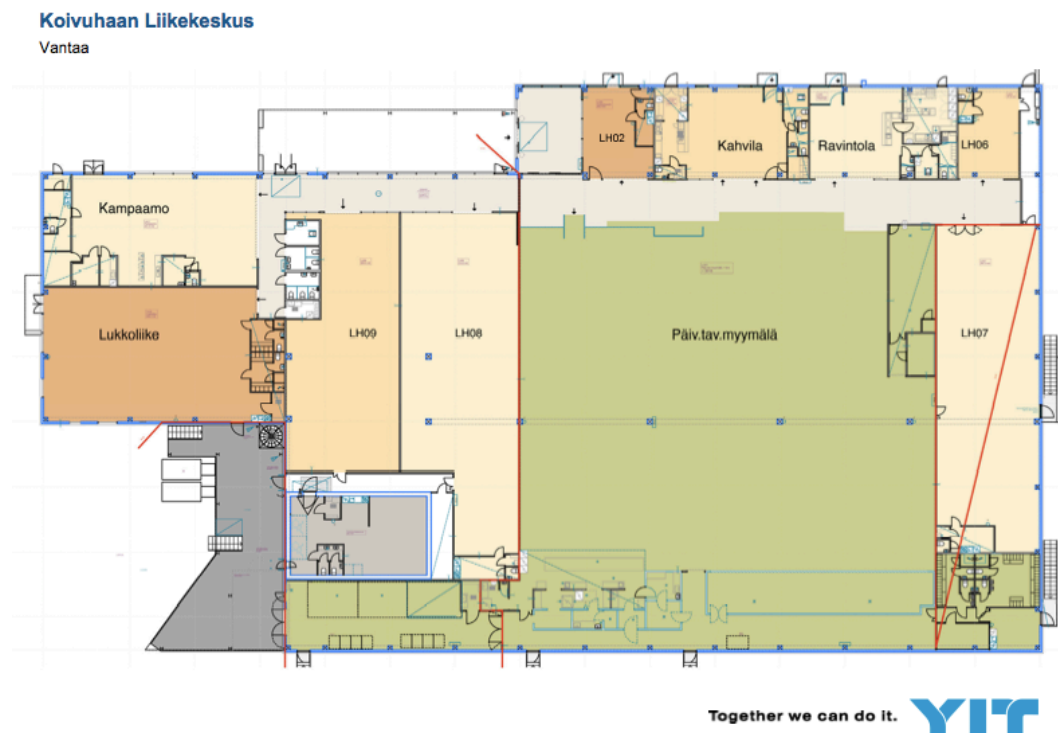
Floor plan for Kouvuha Shopping Centre (YIT 2009)
